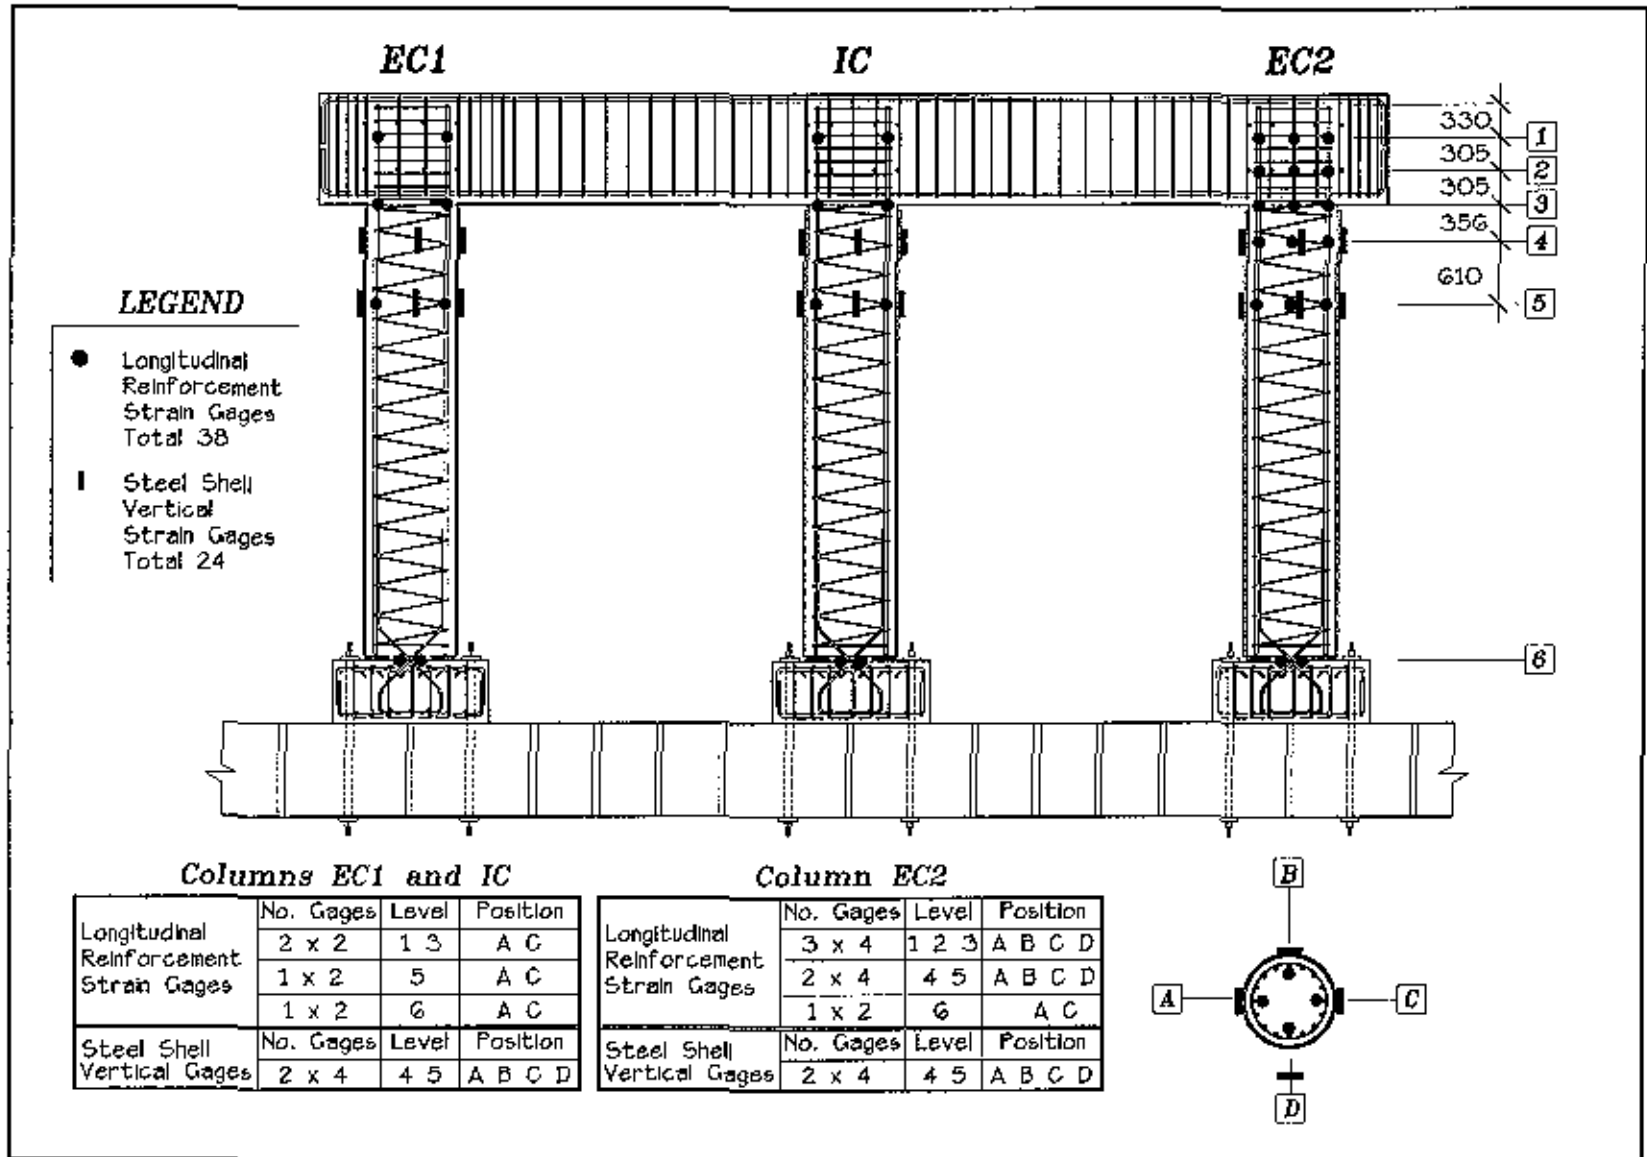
Steel Shell and Longitudinal Reinforcement Vertical Strain Gage Layout
